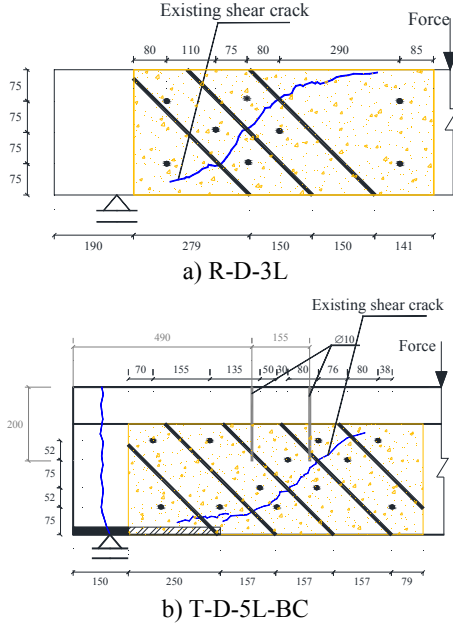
Shear strengthening details of repaired beams (dimensions in mm)
